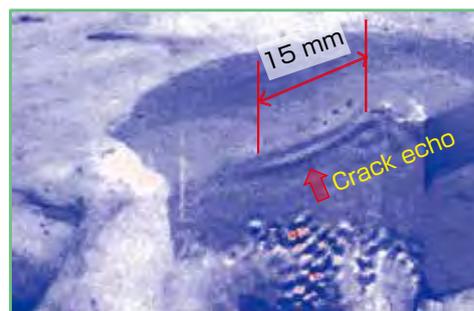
Fatigue crack echo of the welded part of steel bridge
